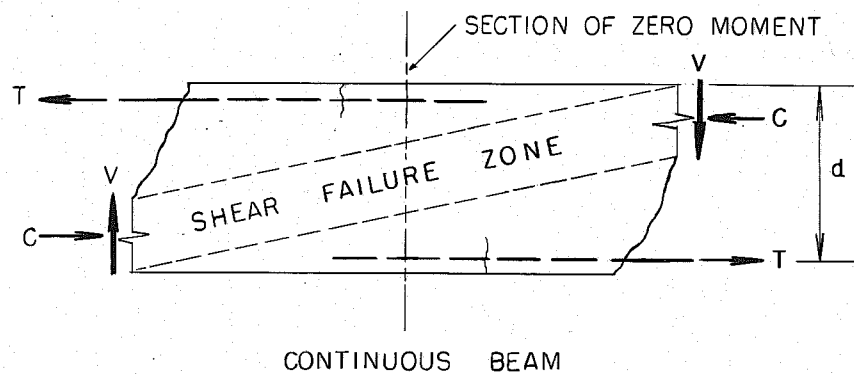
SHEAR FAILURE IN A CONTINUOUS BEAM
